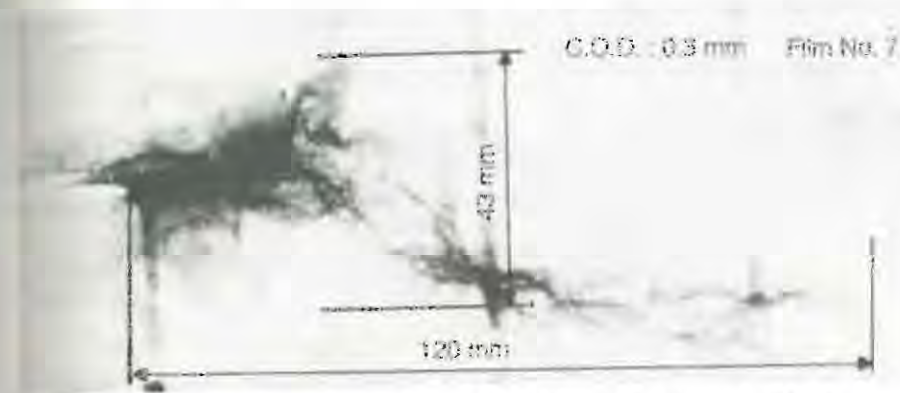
A zone of fine cracks and clouded parts after the peak of load.
